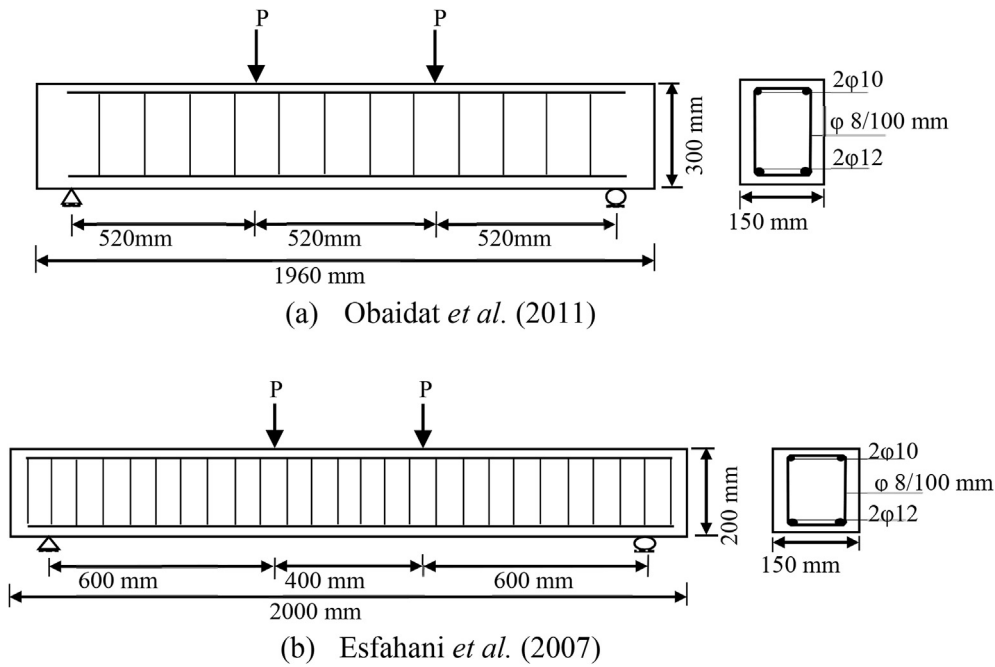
Geometry, arrangement of reinforcement, and load location of tested beams.
